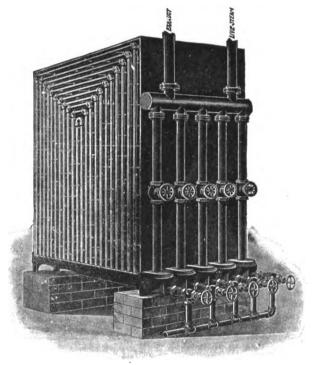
Large Coil-Pipe Radiator Encased in Sheet-Steel Housing.
